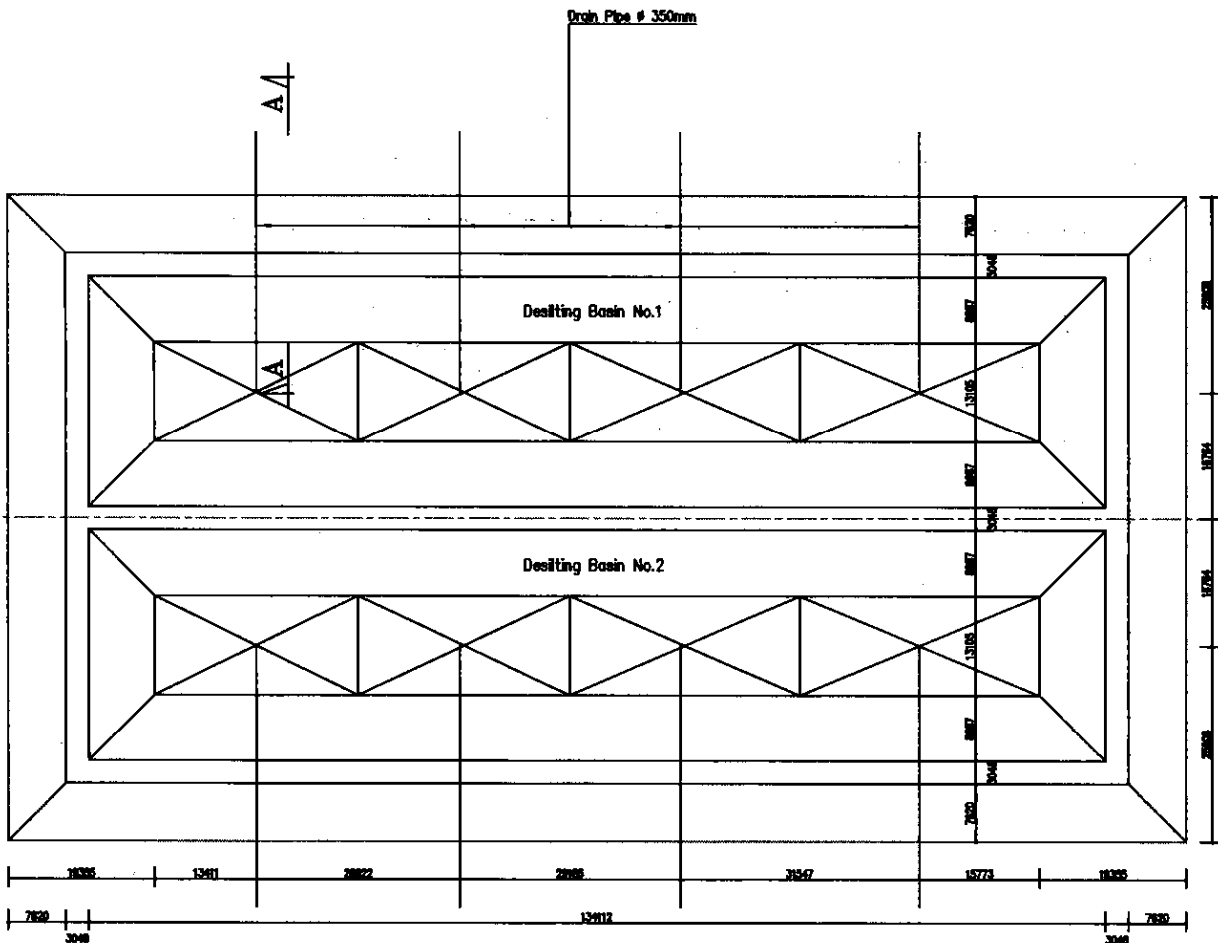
LAYOUT PLAN OF EXISTING FACILITIES
